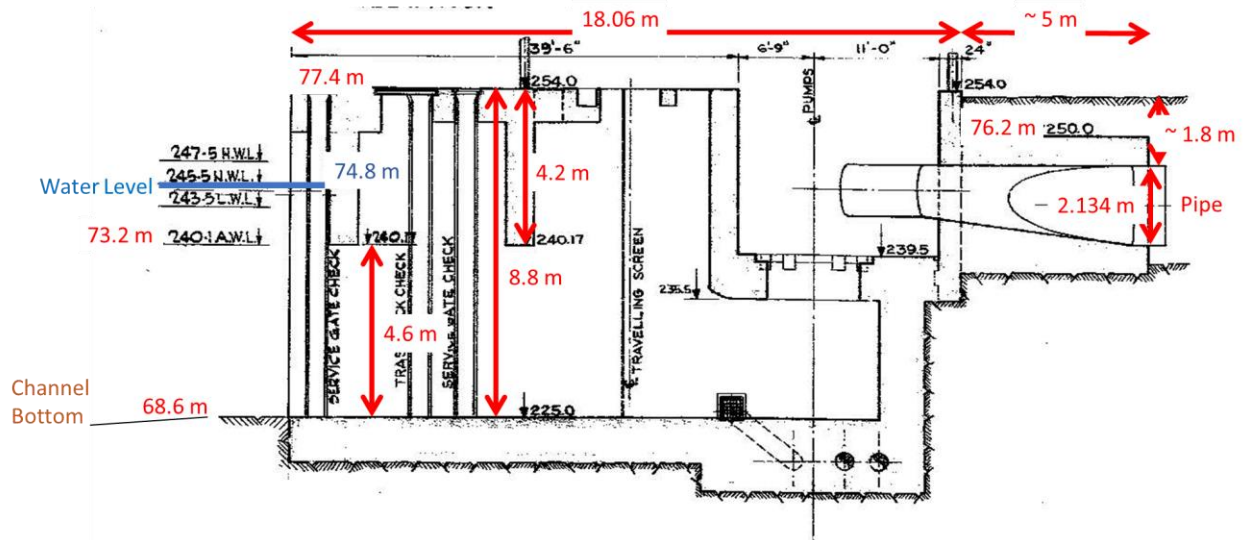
Cross-section of Pumphouse 3 from historical drawing (NA21-D H-00000-1764_DRG_000_v00)
